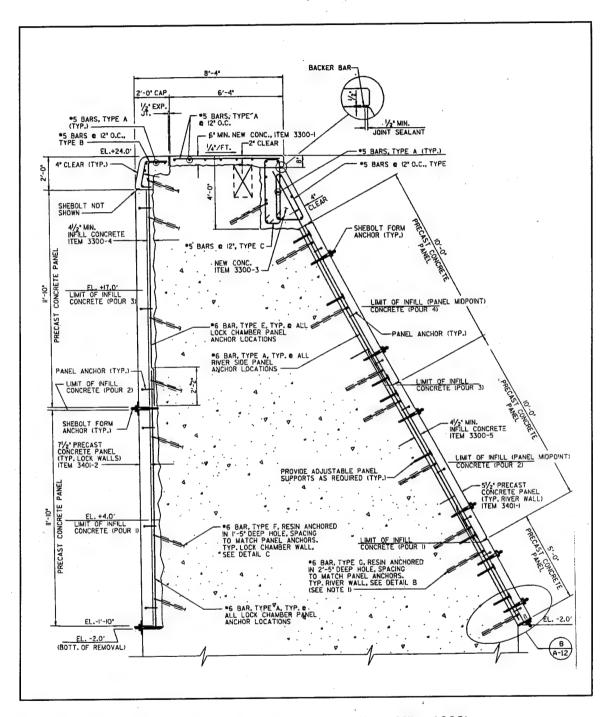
Typical river wall repair section, Troy Lock (from Miles 1993)
